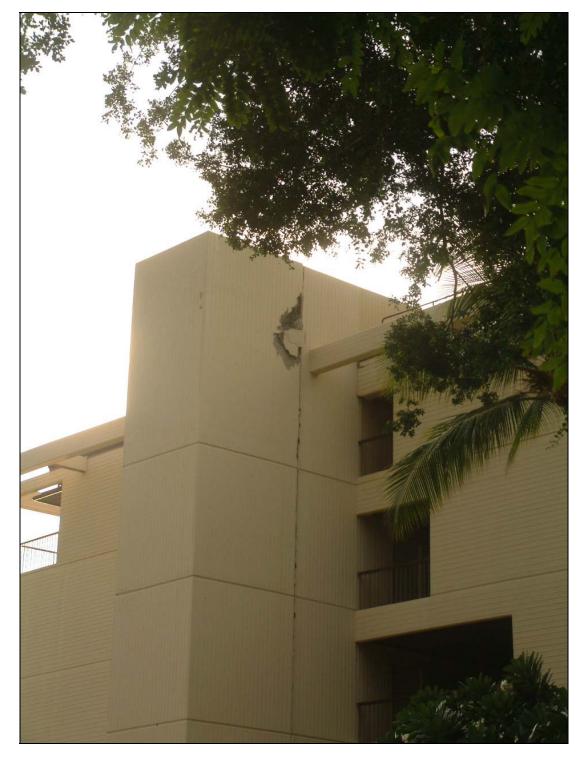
Damage to concrete exhaust flume at connector plate – east side. (Photograph by Gary Chock)
